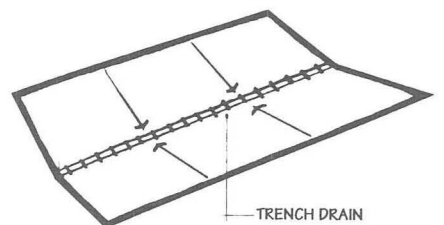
Two perimeter edges level—minimum slopes to trench drain.
